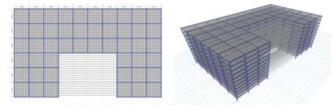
Model2Buildingwith WaffleSlab: Plan &3Dmodel
